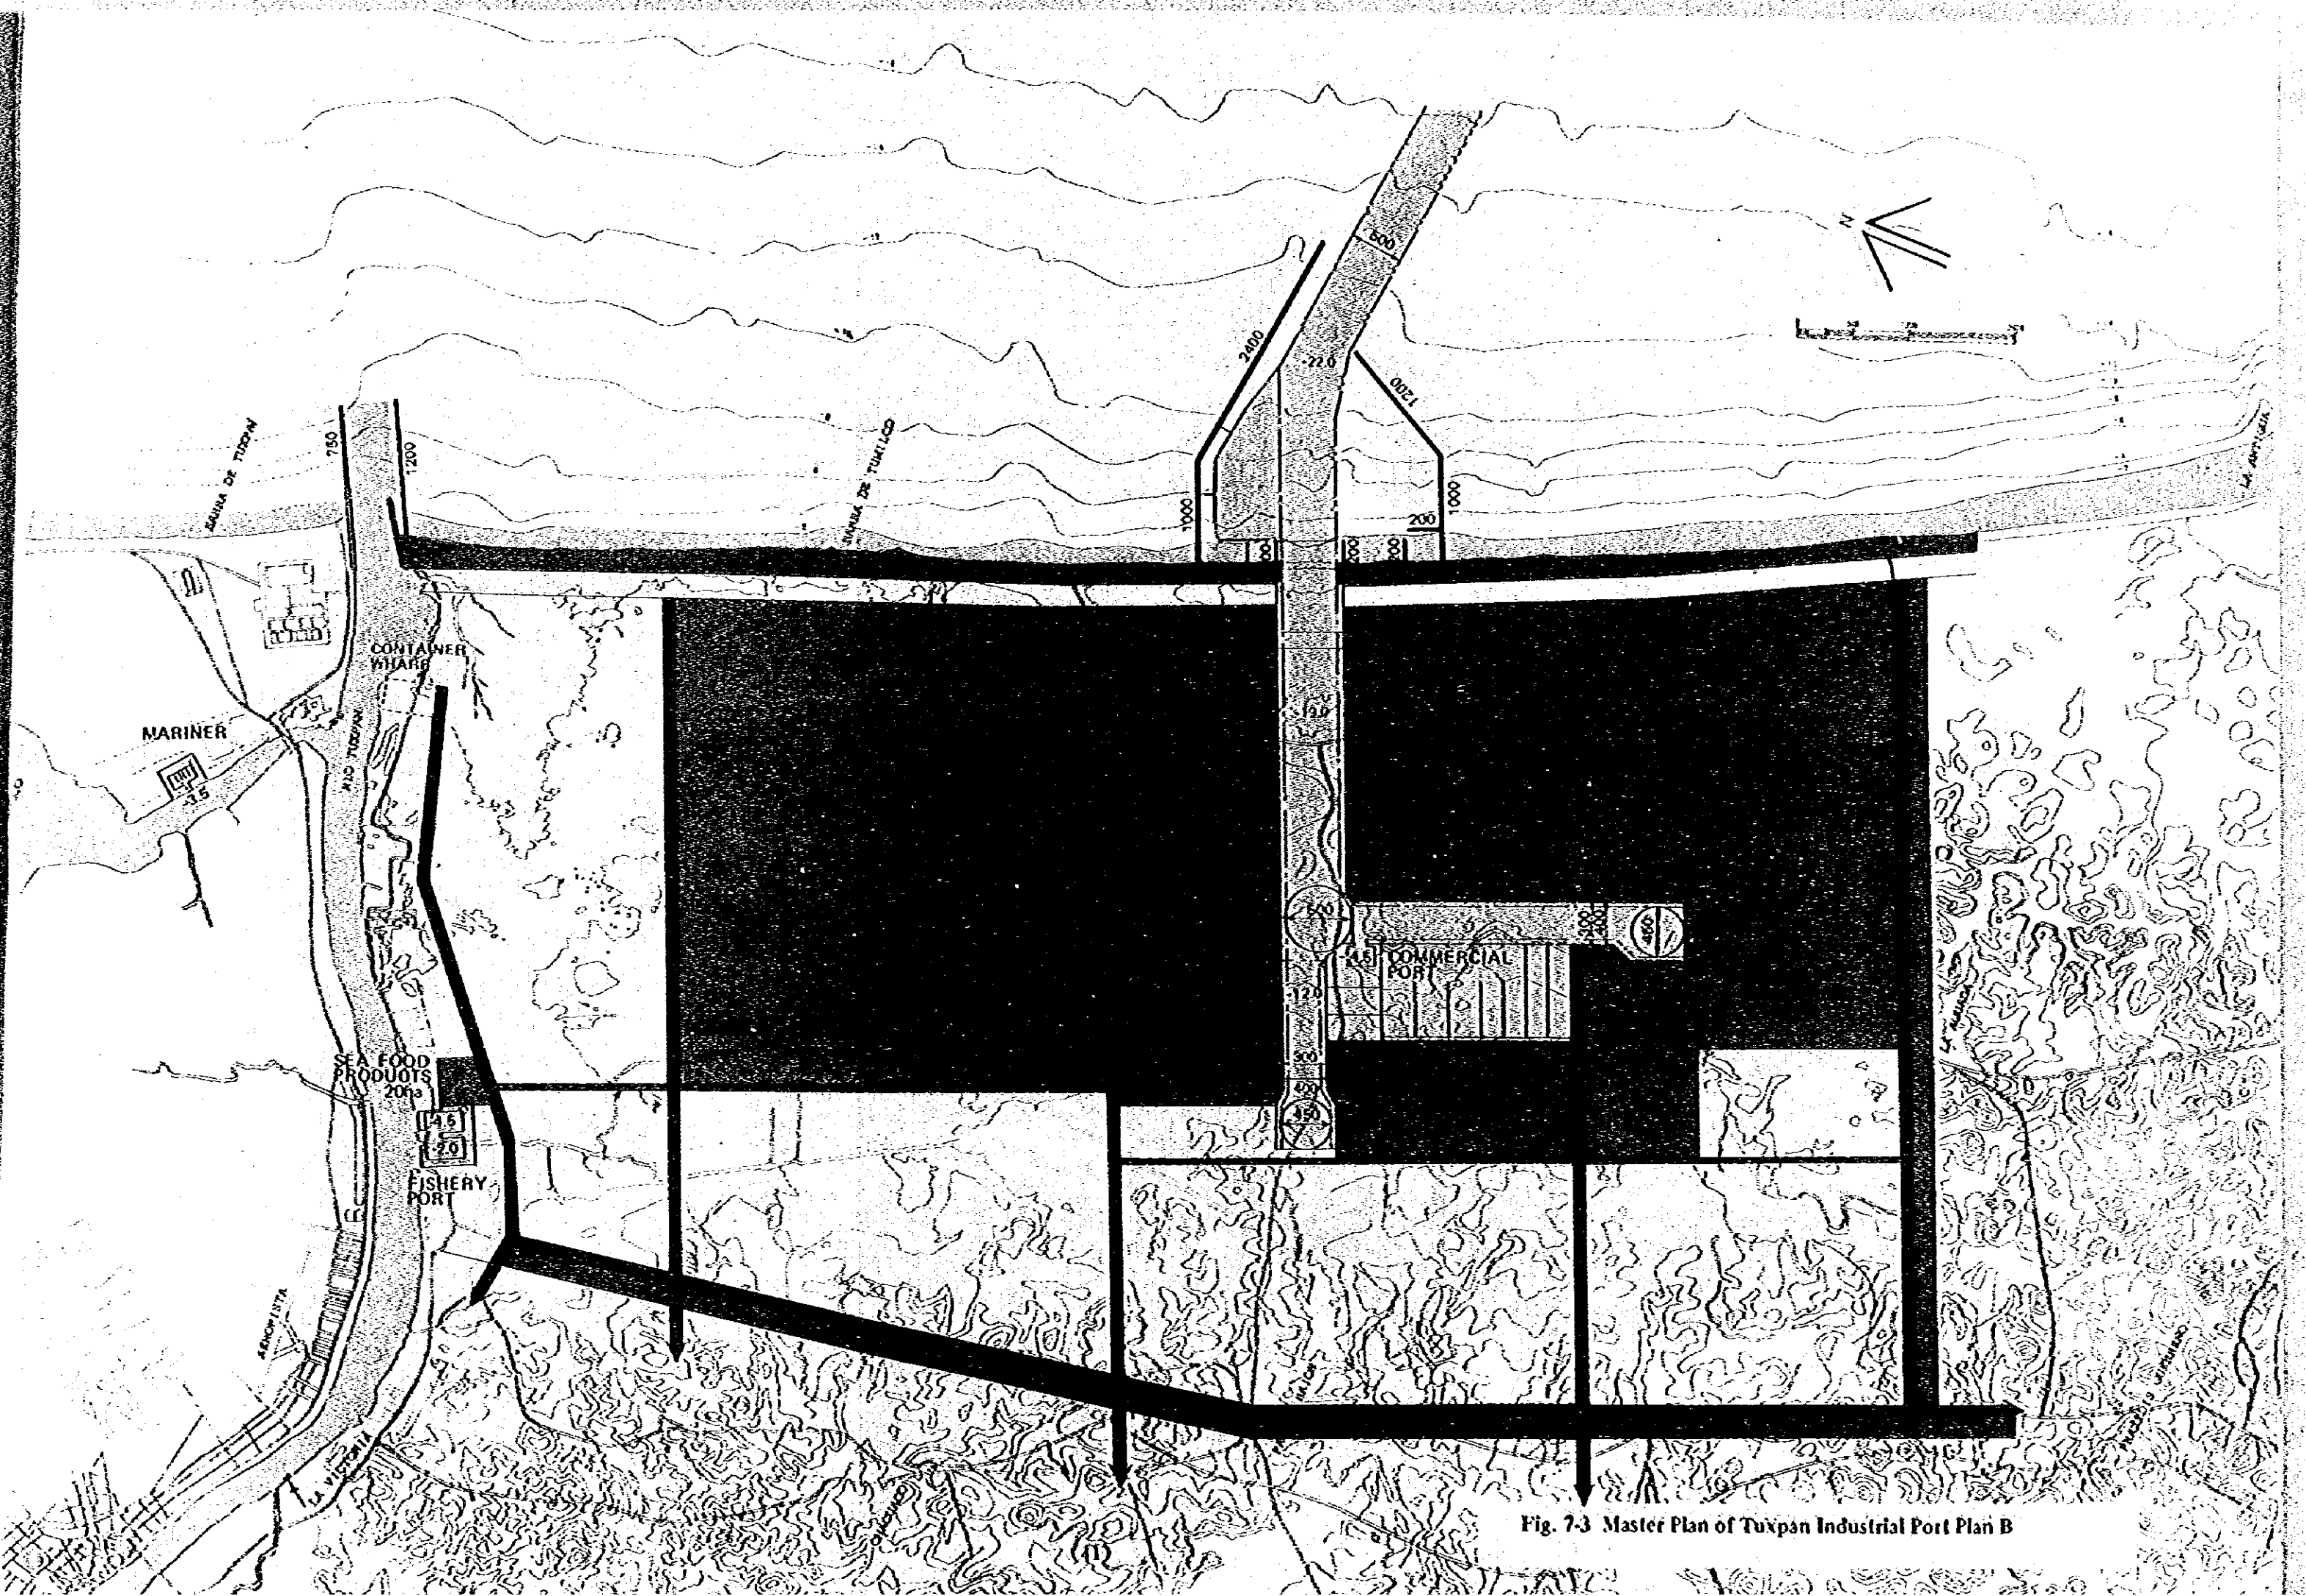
Master Plan of Tuxpan Industrial Port Plan B
